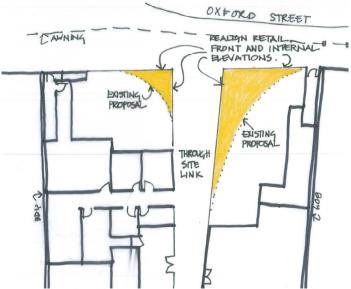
Extract of ground floor plan showing how glazing to retail should be realigned. Yellow denotes new internal area. Dotted line shows location of glazing on DA drawings.
